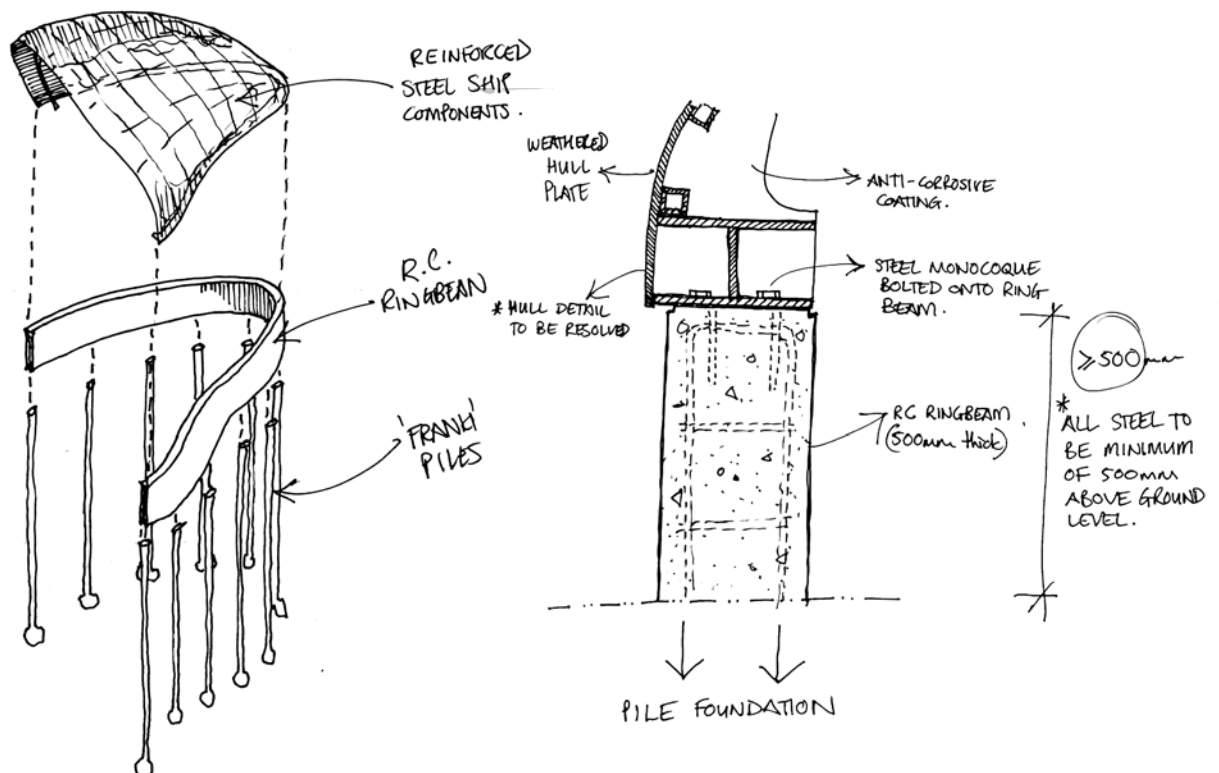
Sketch design of the basic structure (piles & ring-beam) and an early detail section of the joint between the steel monocoque and the reinforced concrete ring-beam.
